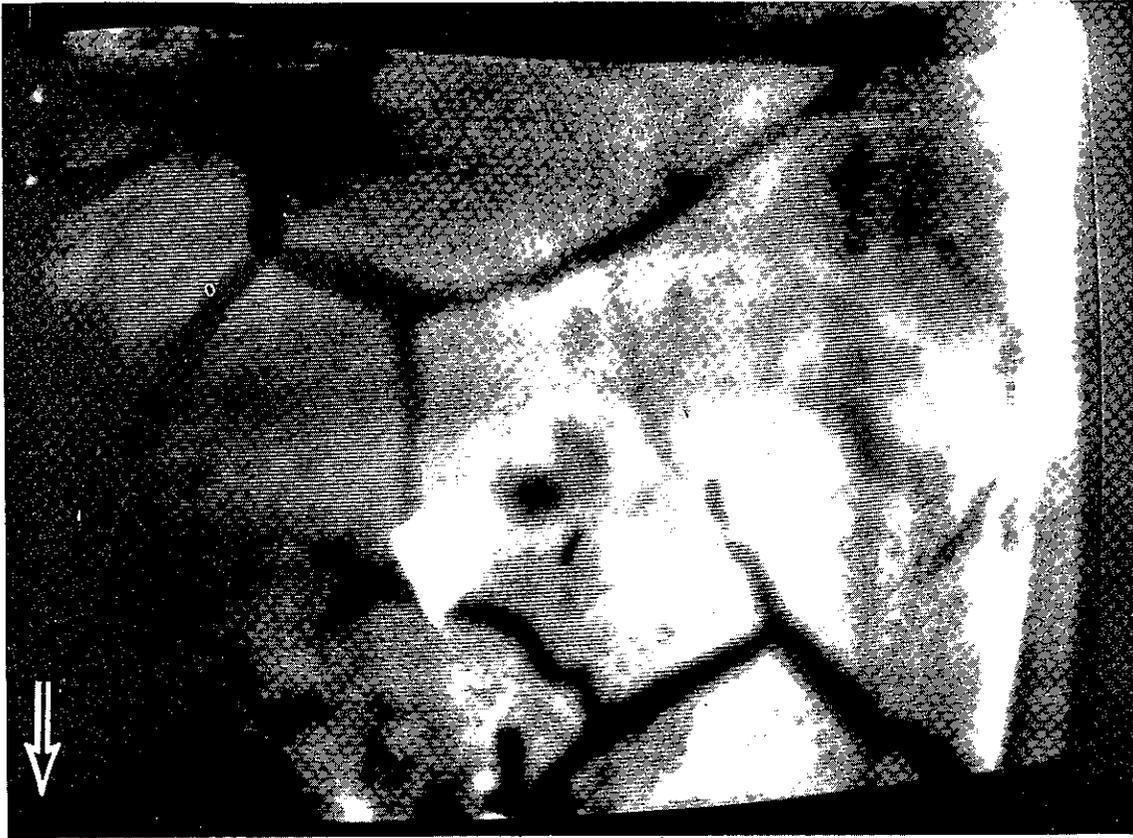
Boring R-5 Anderson Grade 6.3 ft. Cracks in mud cake on boring wall.
